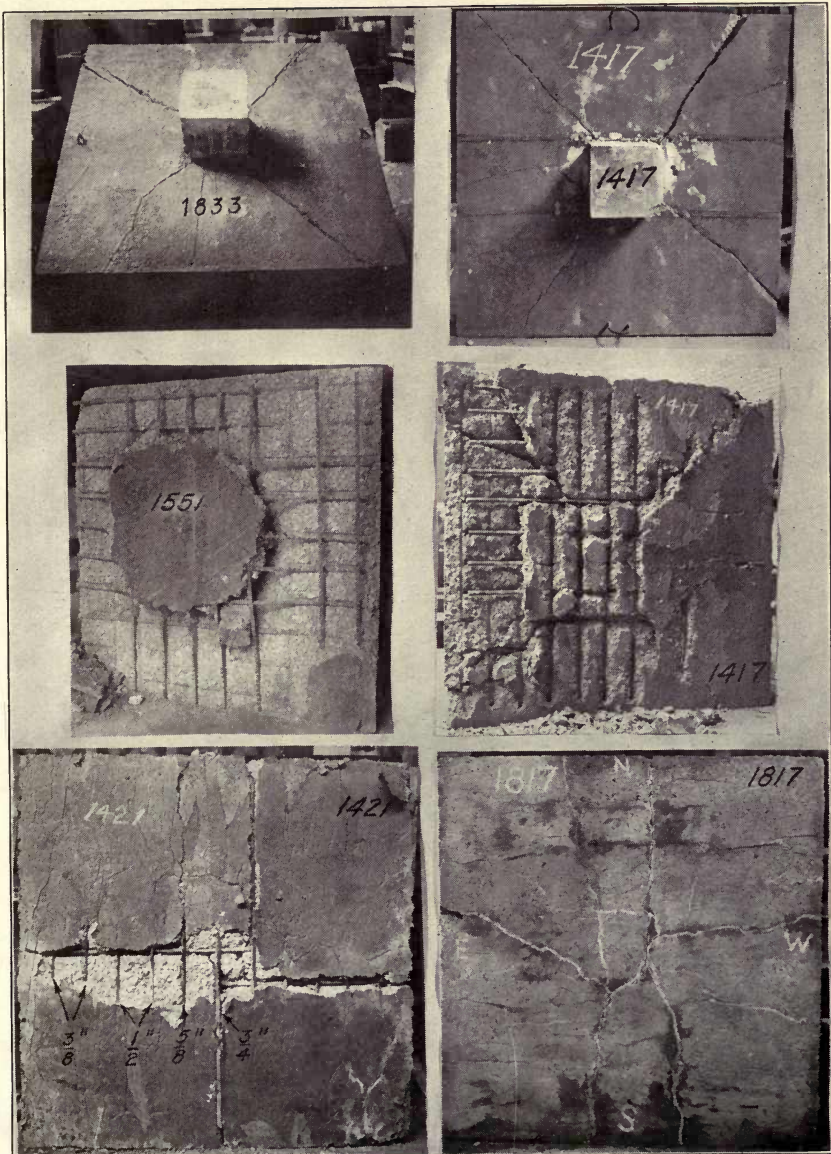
VIEWS SHOWING COLUMN FOOTINGS AFTER FAILURE.
